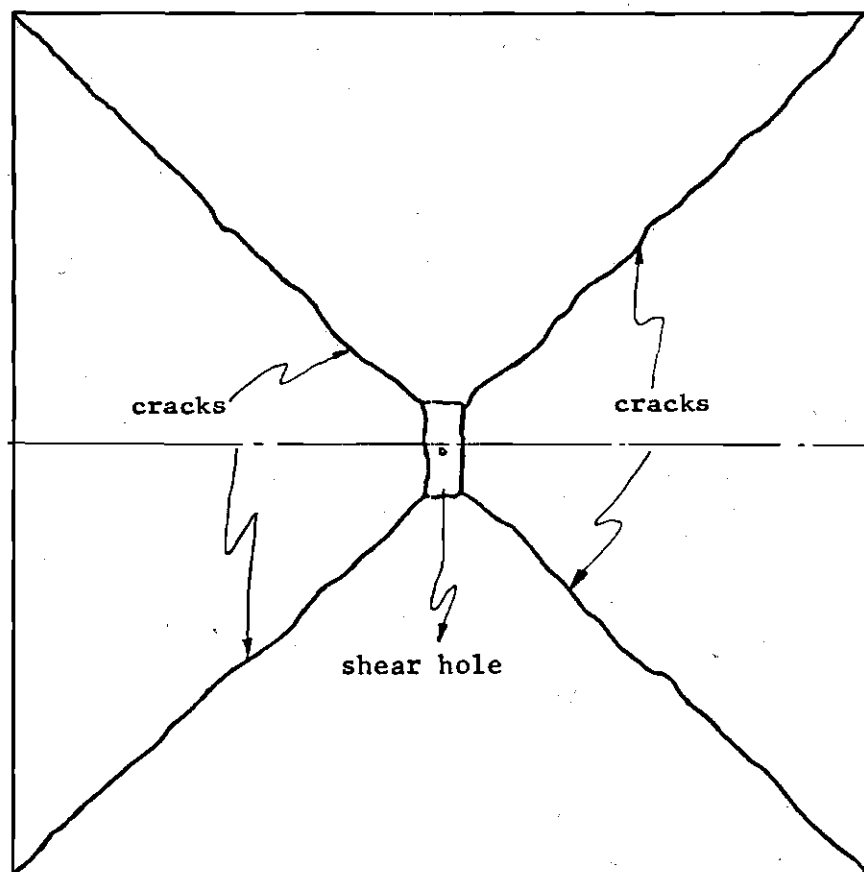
Crack Pattern on Top of Hard Layer for the four and eight-inch footings--all slab thicknesses.
